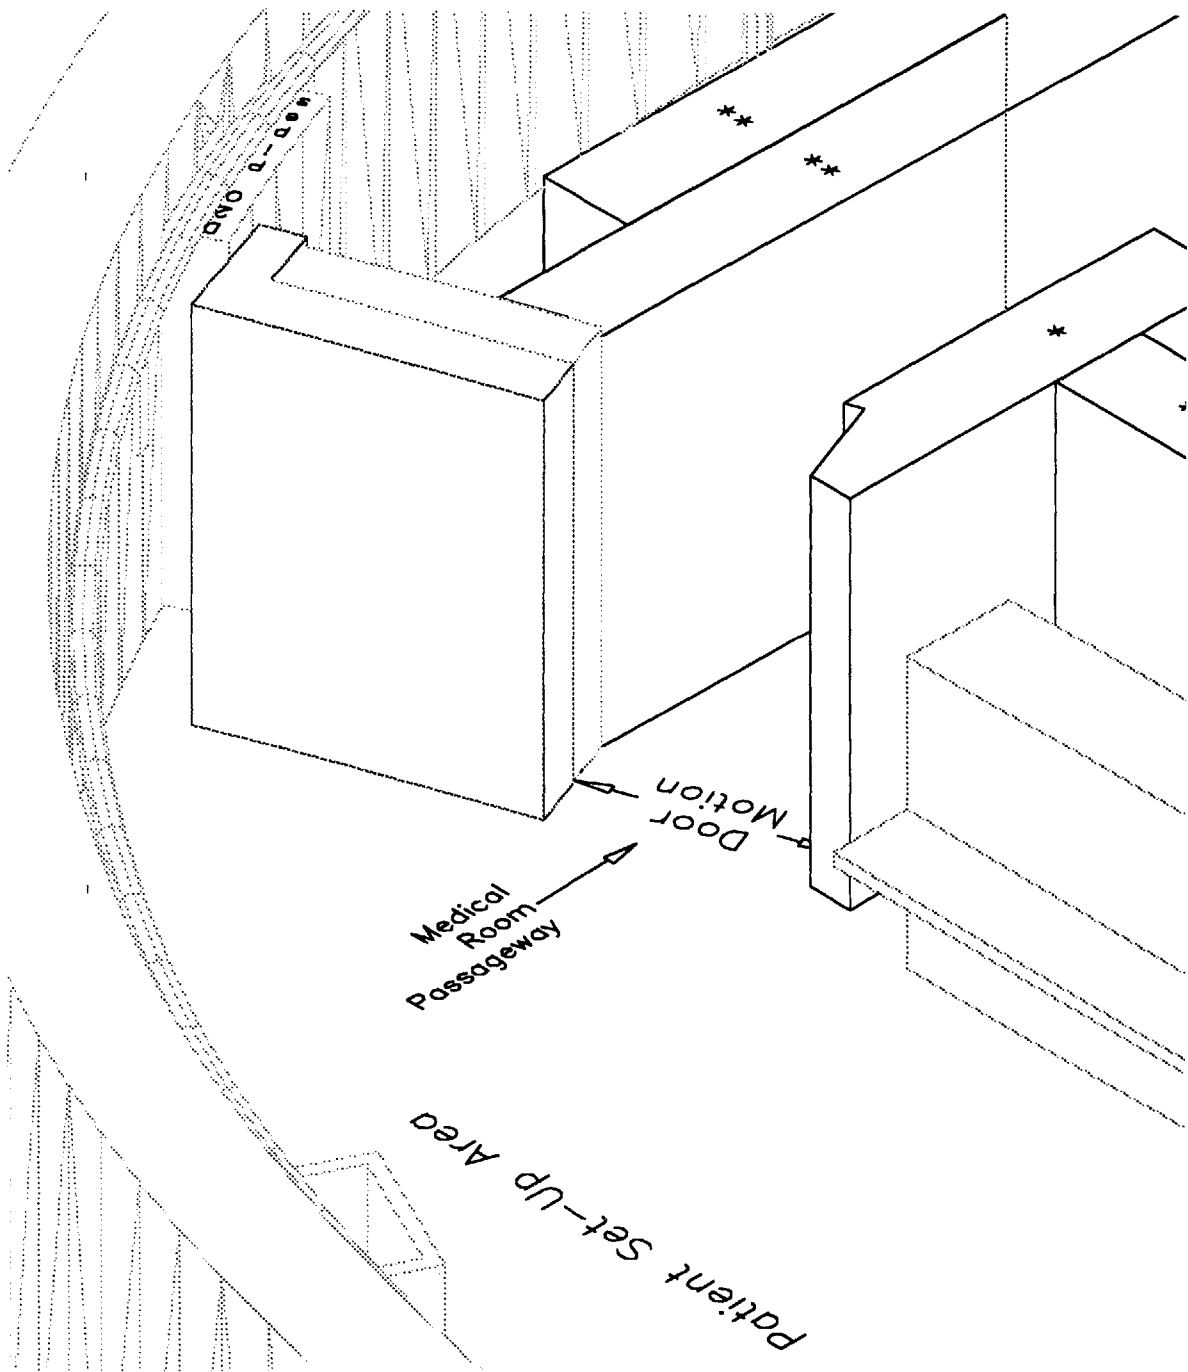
Slanted Sliding Door -- Isometric View (support structure for door not shown).
